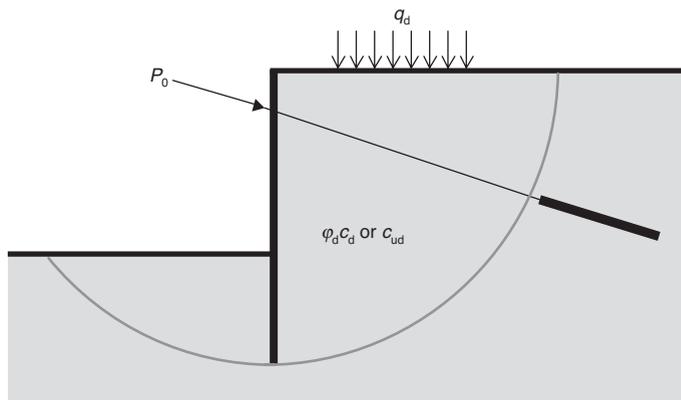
Design of the retaining wall. The prestress force (lock-off), P_0 , is a favourable action in the design of the wall and for overall stability
